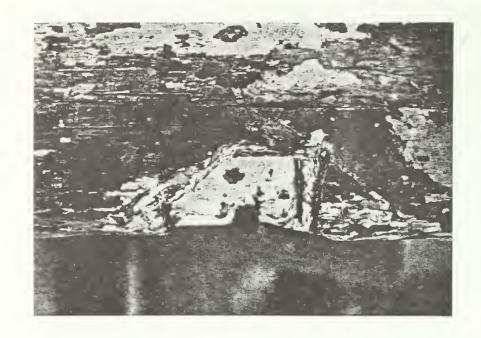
West India Goods Store, interior of second story, east wall looking north, post between bays B and A, showing cut made to accept possible partition framing.
